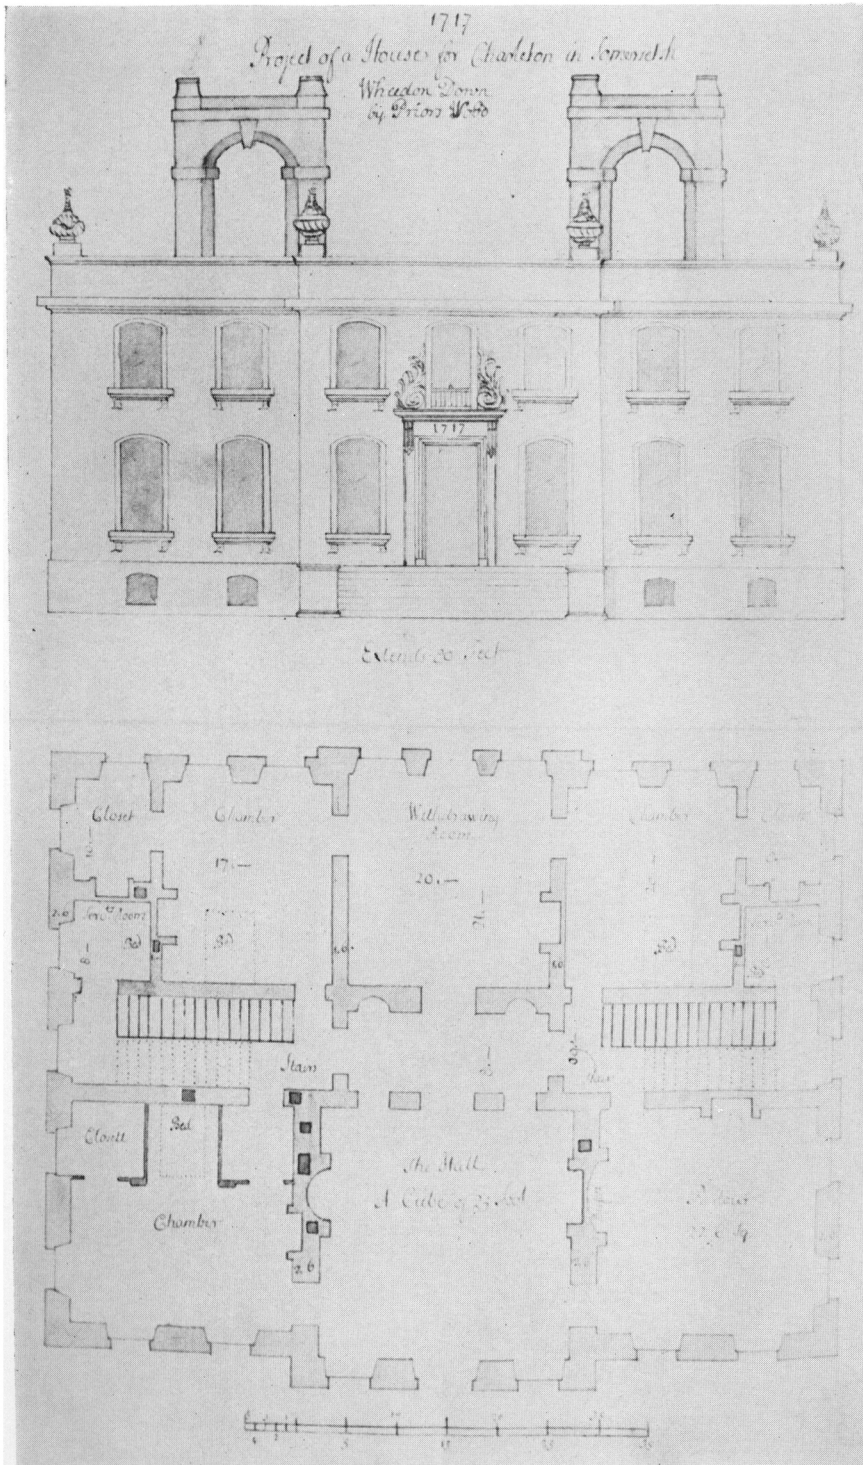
Plan and elevation for Charlton House, 1717 [64]
